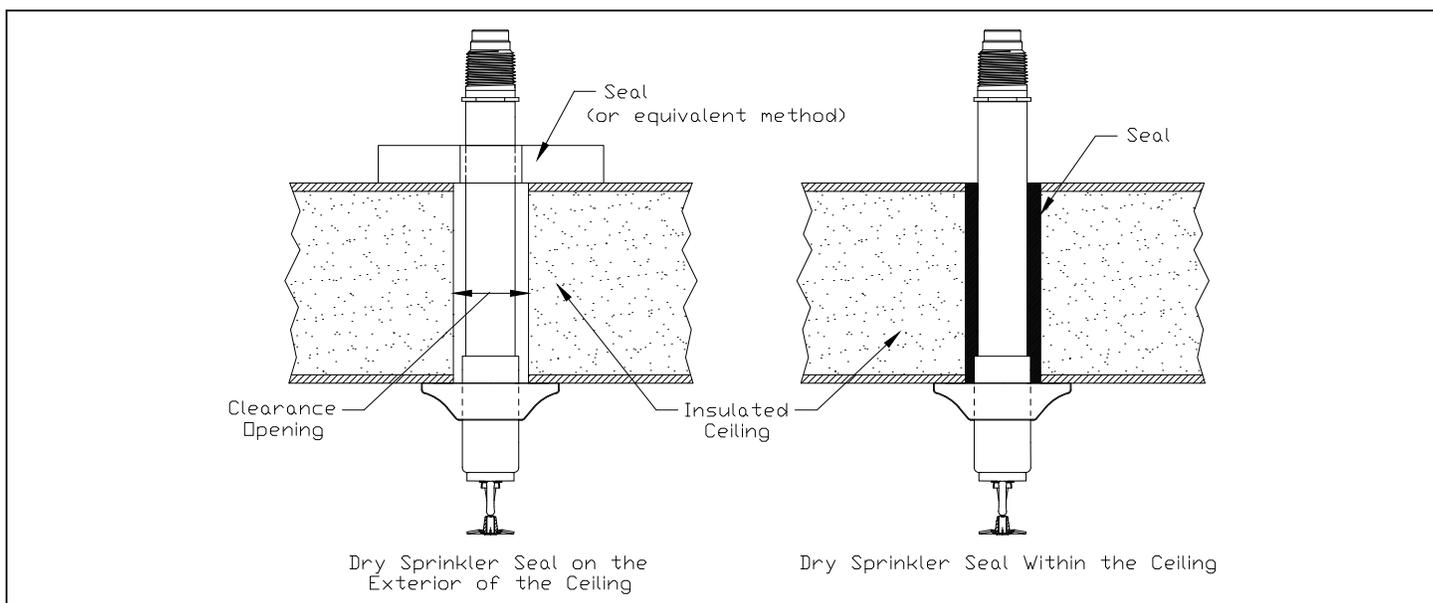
Dry Sprinkler Seal (Adjustable Standard Dry Pendent Sprinkler is Shown)
